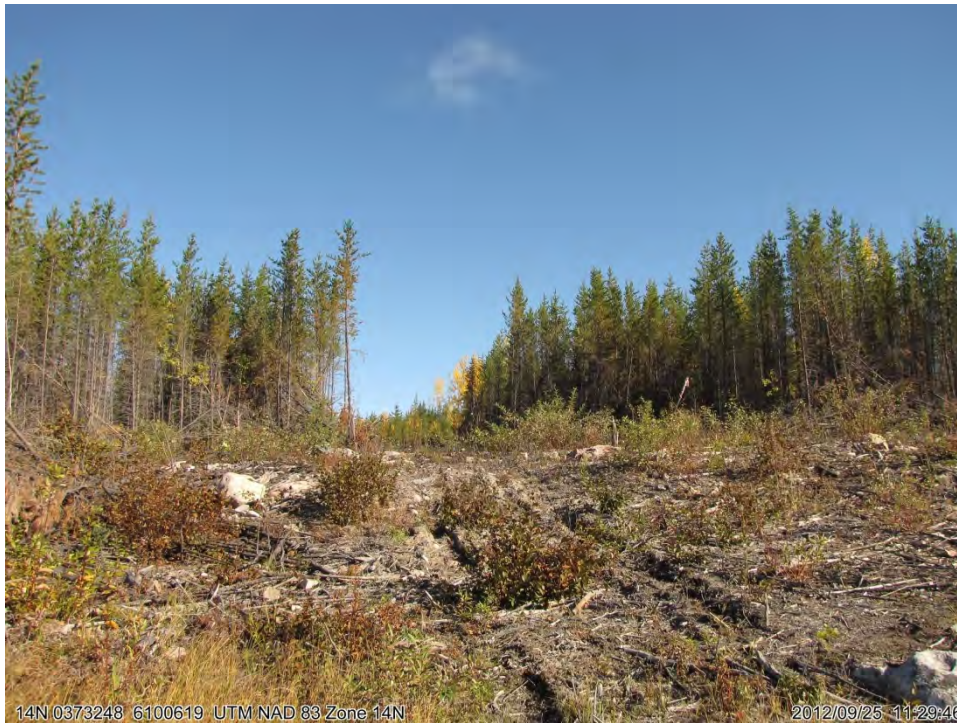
September 25, 2012: Pit 4 with Fire Pond in Background, Looking South-East ↑
